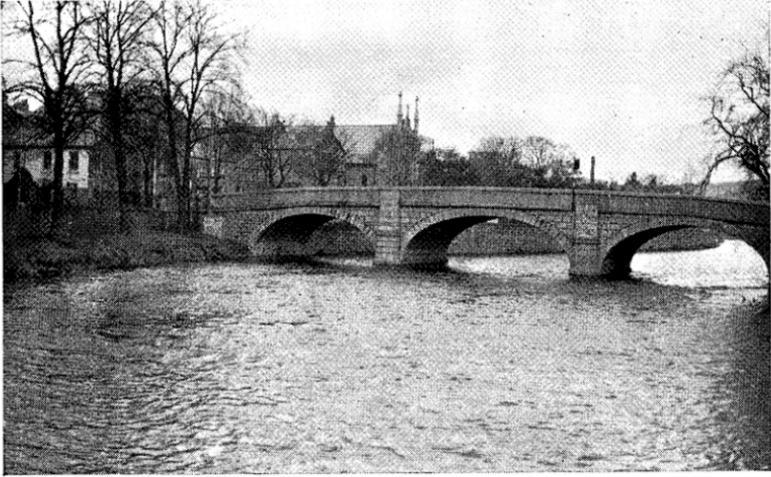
PLATE I.—*Kent Bridge*, now called *Miller Bridge*, leading from the centre of Kendal to Canal Head. Designed by Francis Webster and built between 20 May 1818 and November 1818. The river retaining wall and railings on the left were built at the same time.
